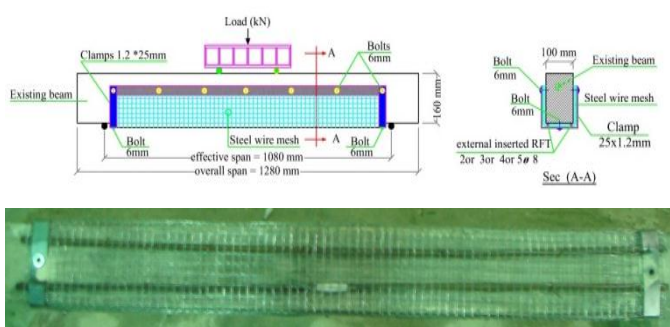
a] External additional horizontal steel bars 2Ø8 and two vertical steel clamps.
